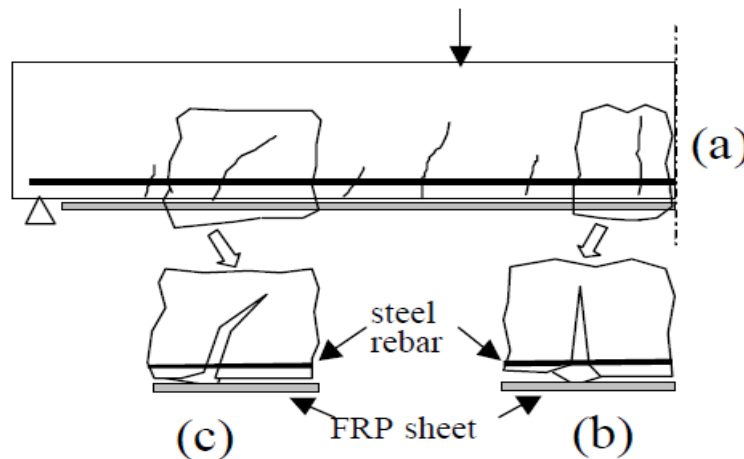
Debonding Failure between FRP Fabric and Concrete
